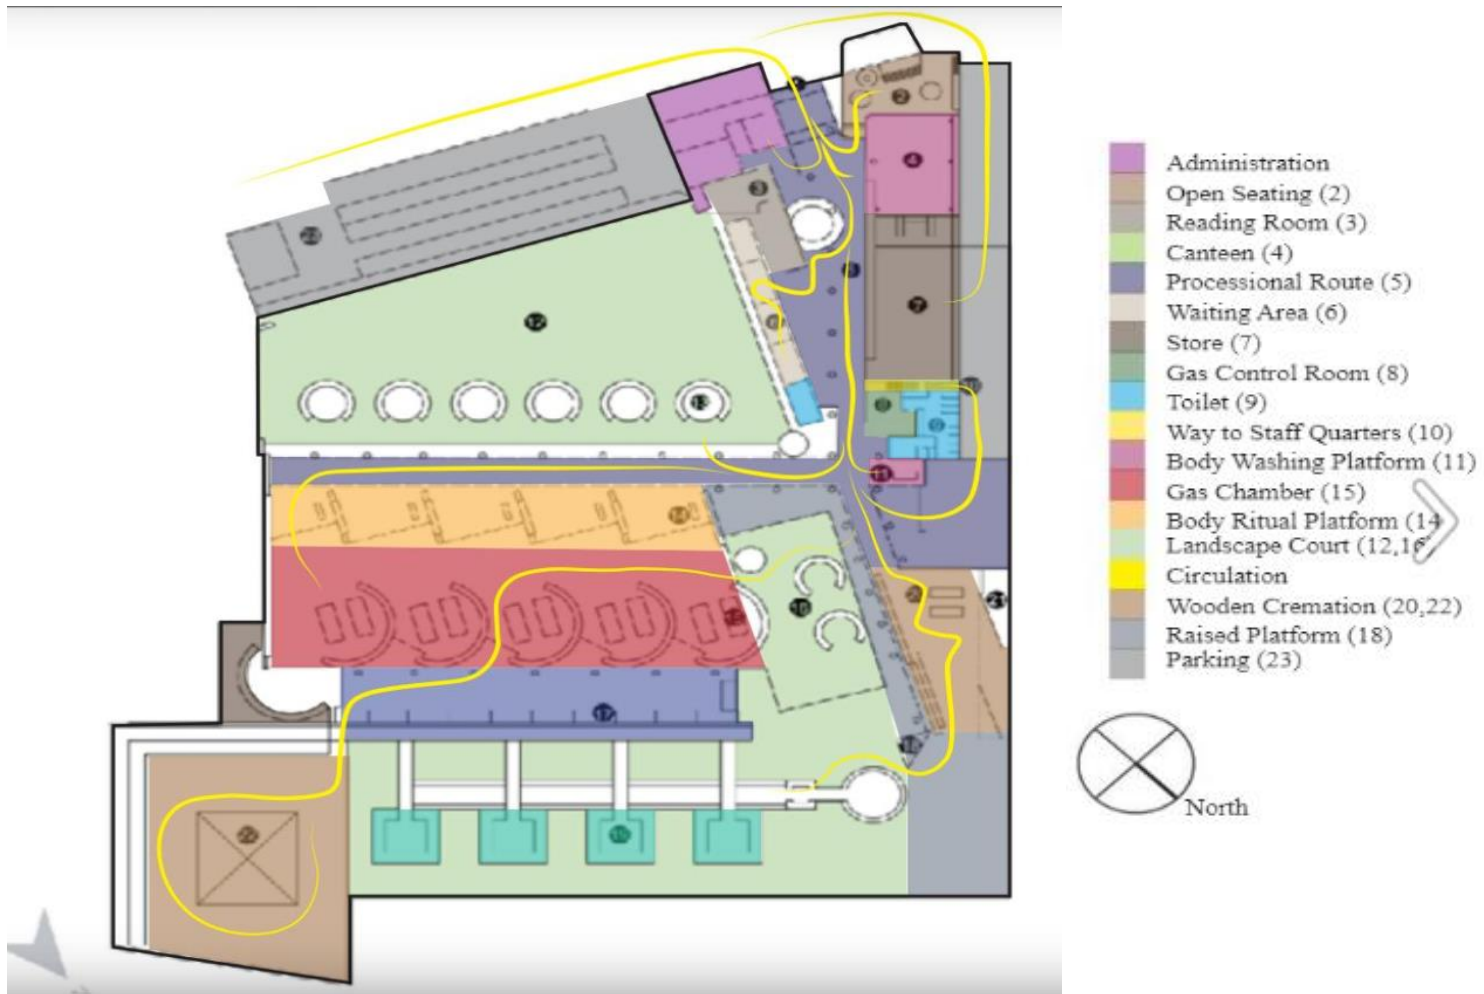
Ashwinikumar Crematorium-Ground floor plan
